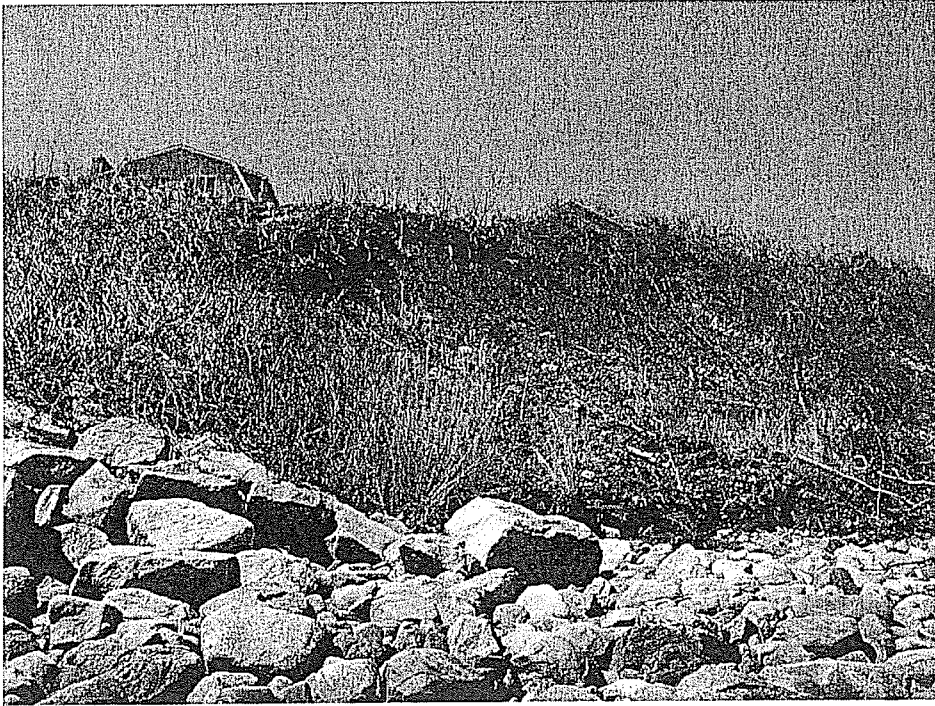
View of storm damage at toe of Cliff Road embankment.
